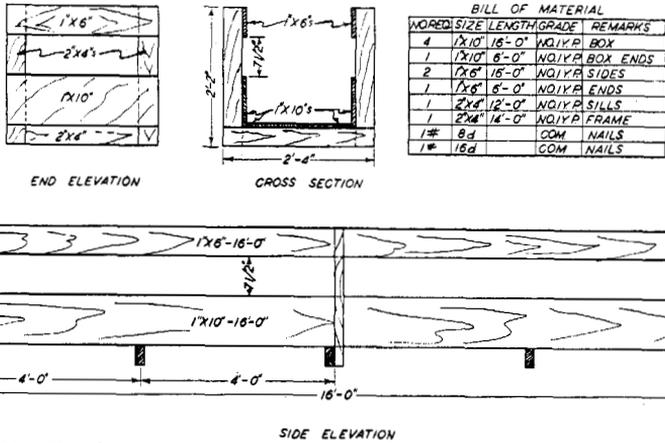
Detail drawing of combination feeder shown in figures 28 and 29.
